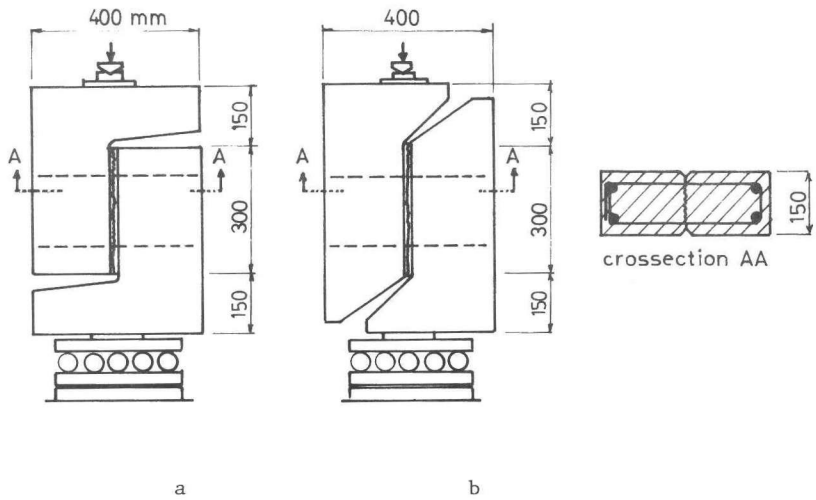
Specimen geometries for tests on reinforced cracks
